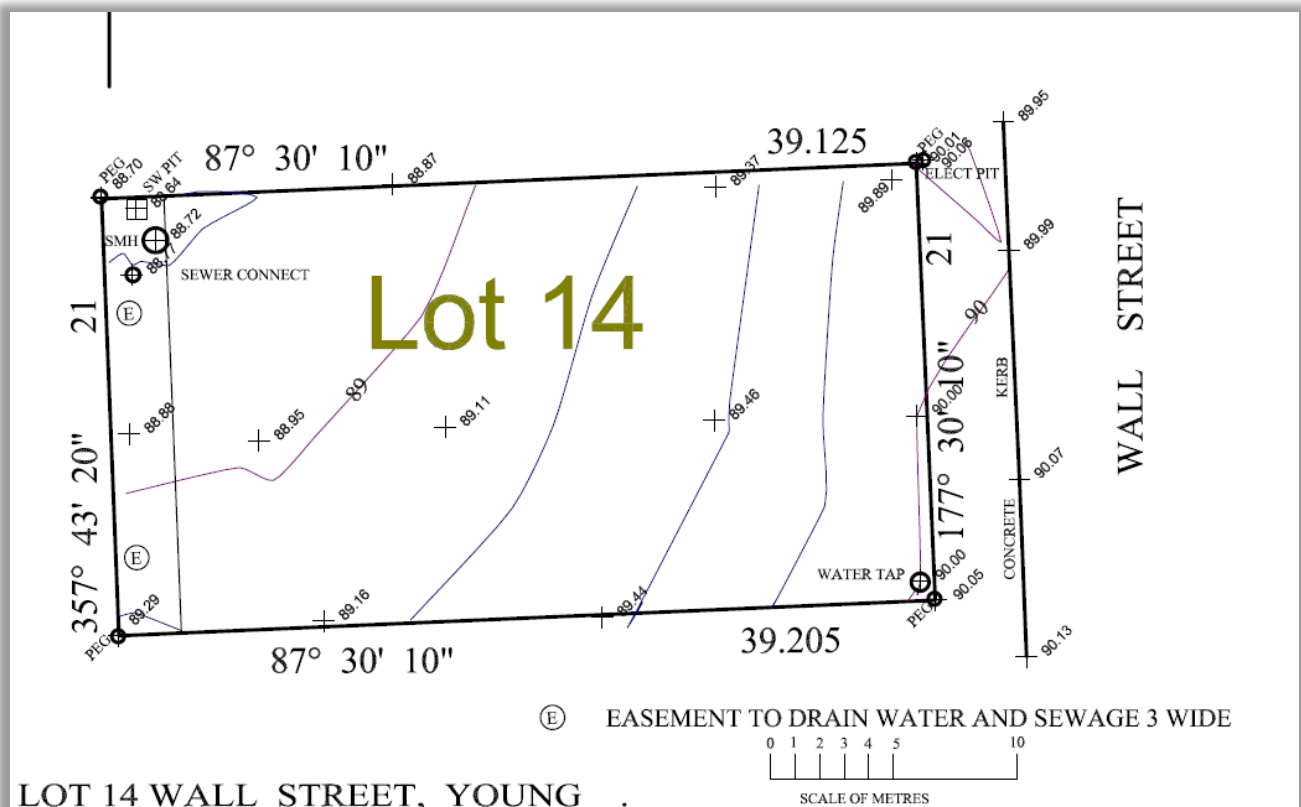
Cadastre & Contour Plan (source SRD Land Survey)
